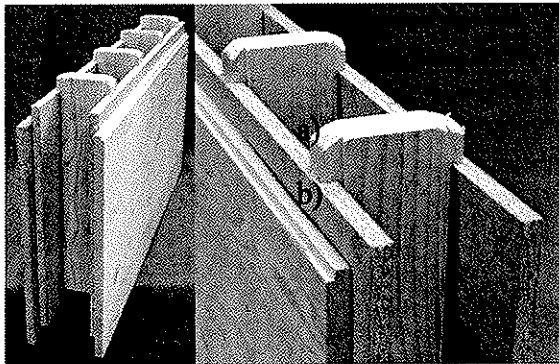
Prefabricated Timber Wall Element (left); Offset of columns (a) offset of layers (b) (right)
